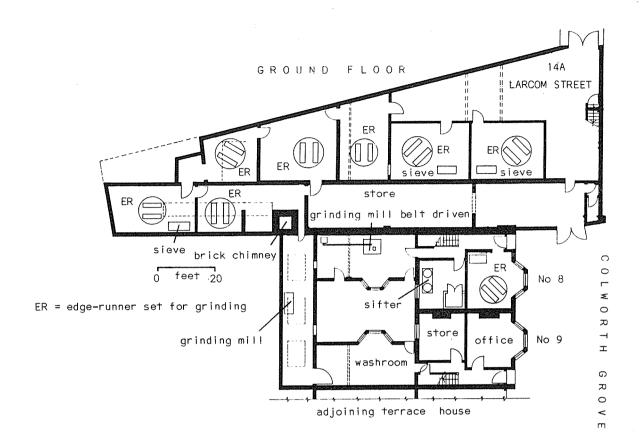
Plan of the ground floor of 8/9 Colworth Grove. Drawn by Rosalind Pilling
